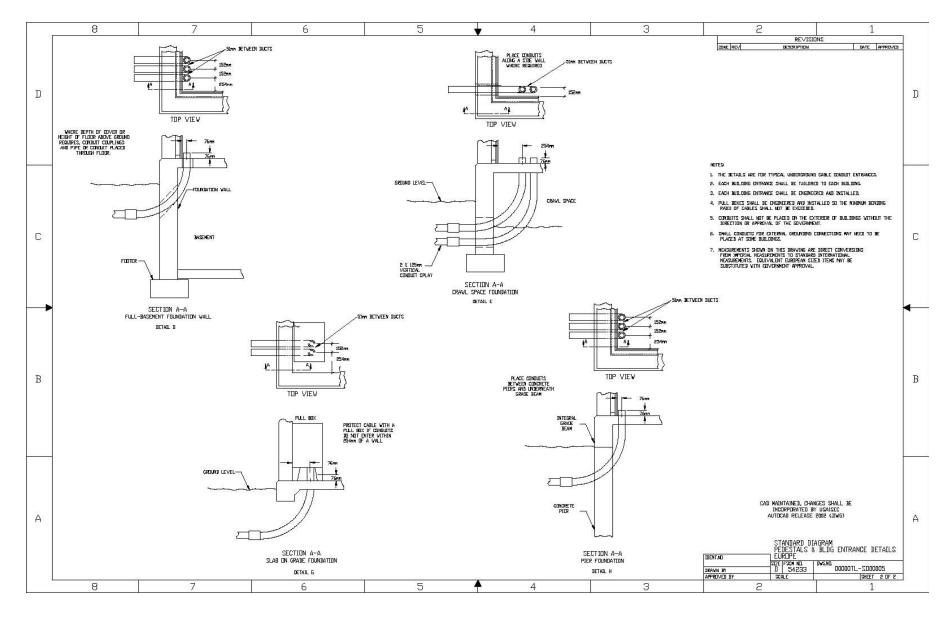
Pedestals and Building Entrance Details – Europe (2 of 2)
